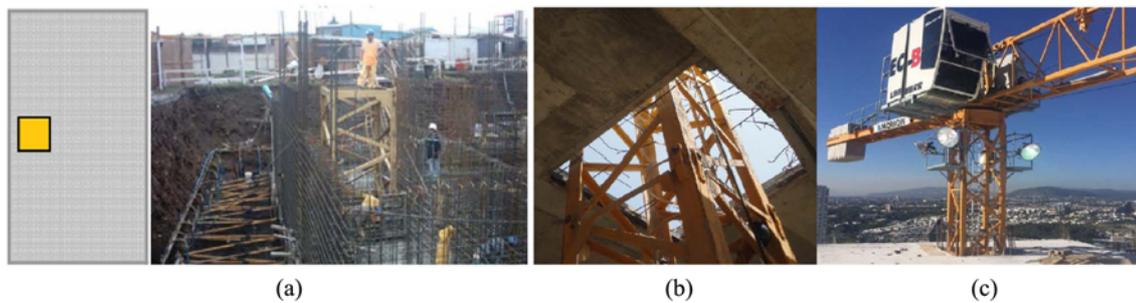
Location of Tower Crane inside the Building: (a) Base of a Tower Crane inside a Building, (b) Hole in Slab (bottom view), (c) Hole in Slab (top view)
